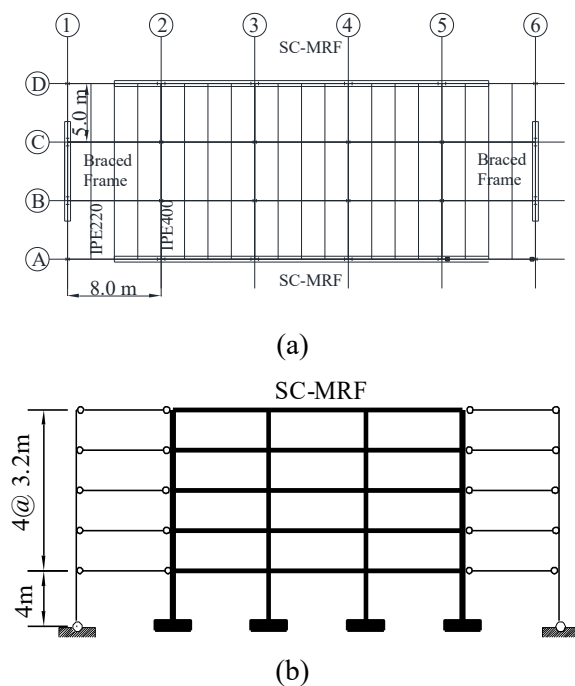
a) Plan view, b) elevation view of the prototype building.
